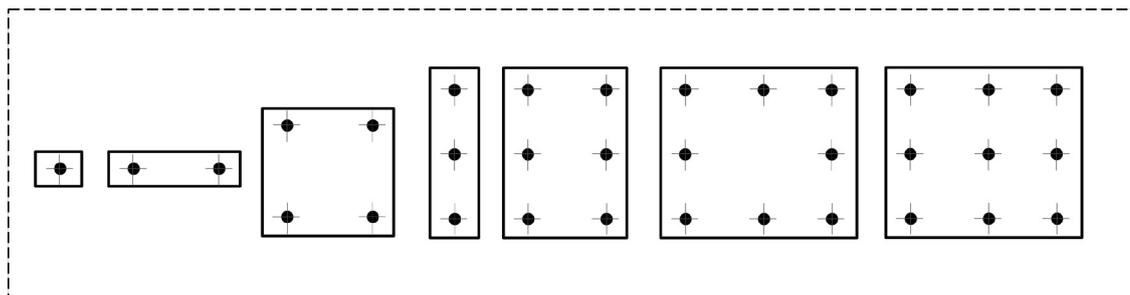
Fastening without hole clearance for all edge distances - by EC2-4 covered configurations
